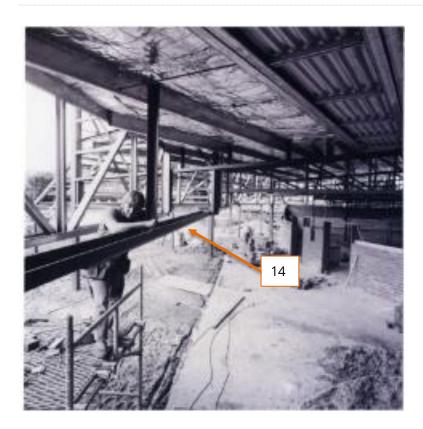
Photo of the construction of the hospital, showing the concrete foundations and scaffolding of the building, dated to c1994 (Source: MAMA & Library Museum, ARM 11.700.65)
